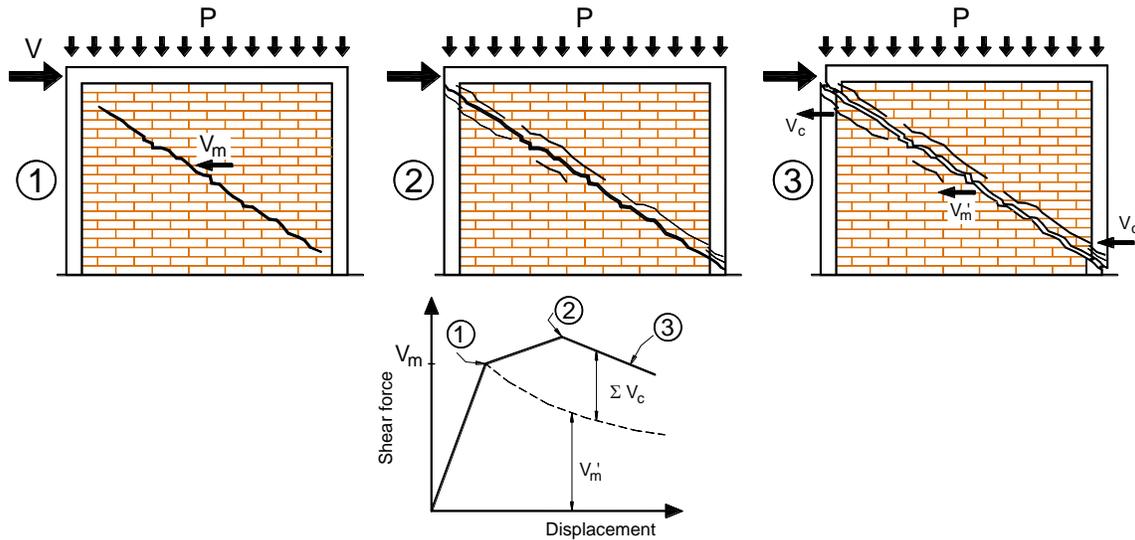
Failure mechanism in composite RC and masonry wall system with shear-dominant behavior is similar to confined masonry (Meli, et al. 2011).
